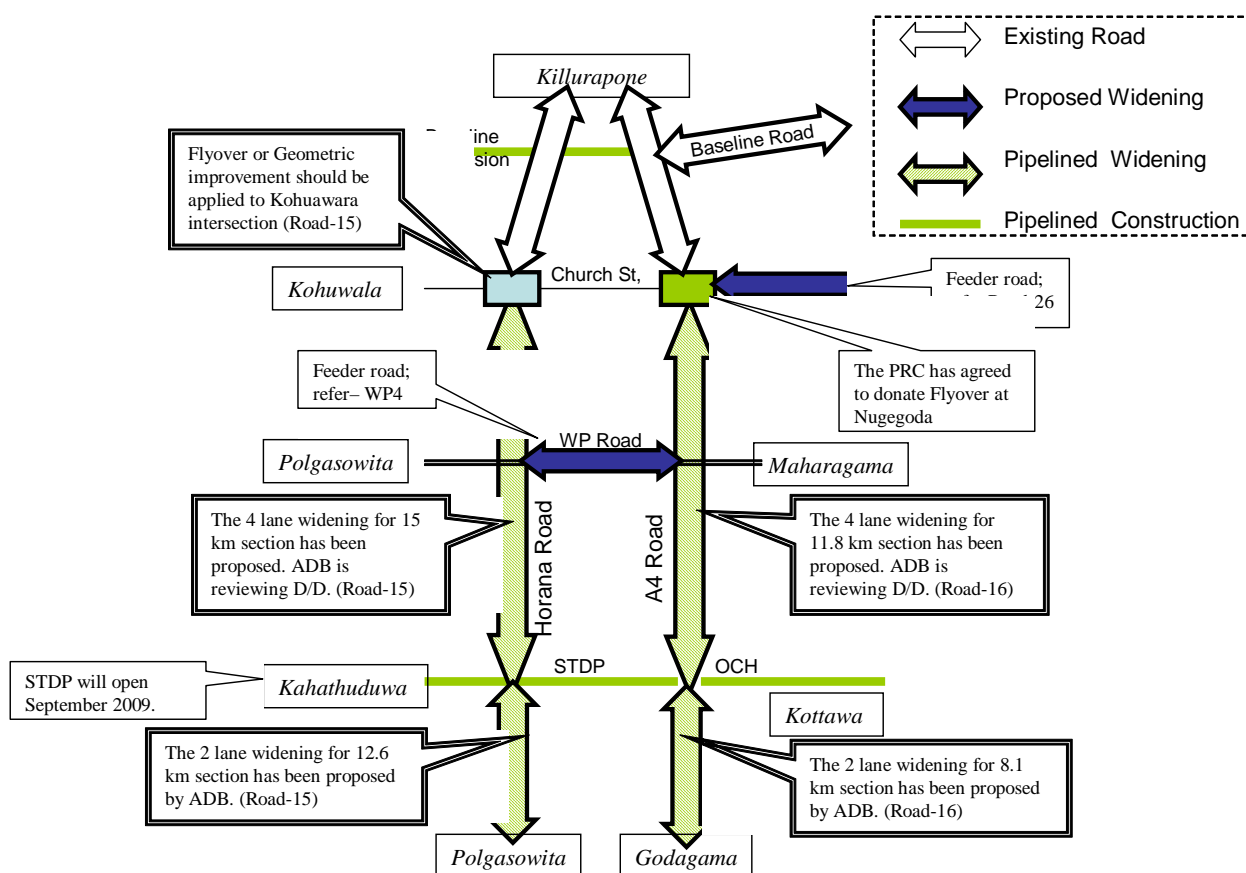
Proposed Improvements for Road-15 and Road-16
